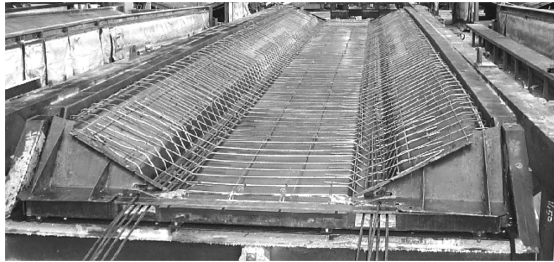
Transverse reinforcement in R-ElemWM specimens.
